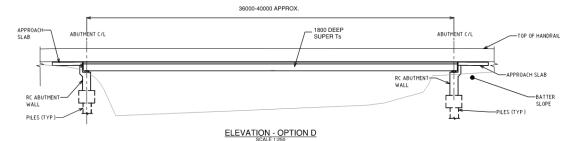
Edwards Bridge Renewal: Option D – Elevation
